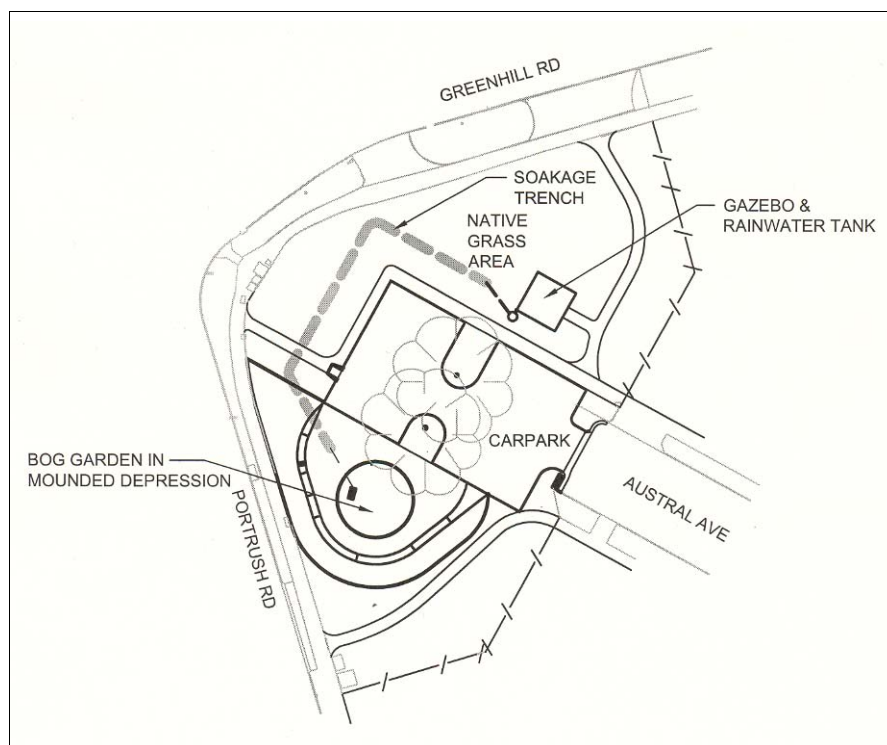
Location Plan of the Pervious Pavements, Linden Gardens
